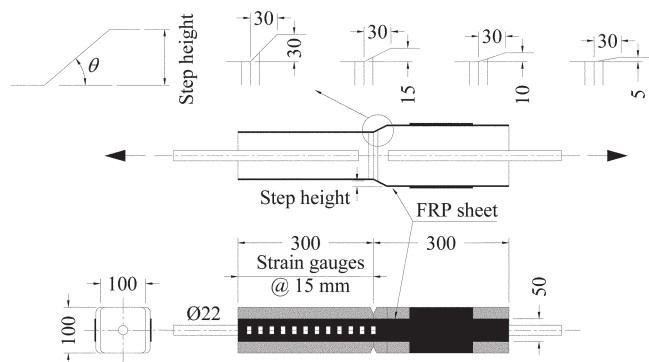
Specimen details. (Note: 1 mm = 0.0394 in.)
